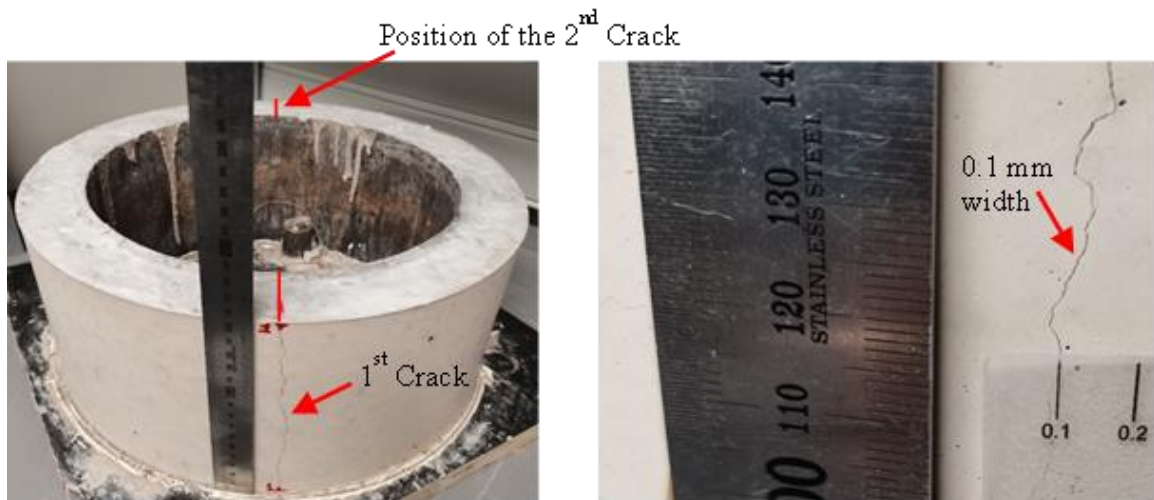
Typical cracks on the concrete ring specimens
